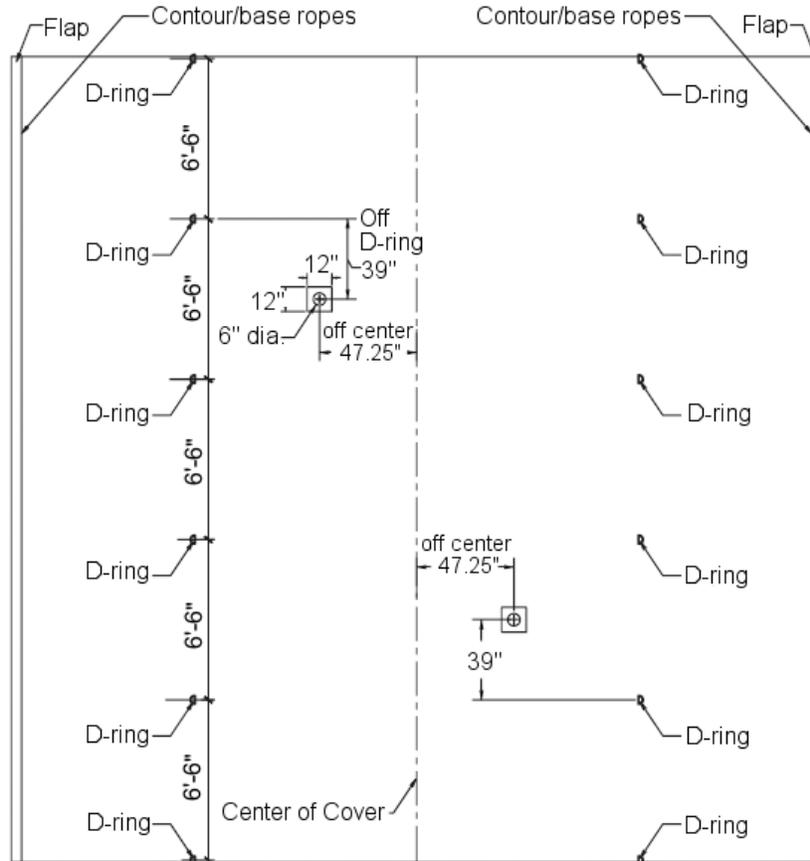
Location of Pipe Flanges (Top view of shelter cover).
